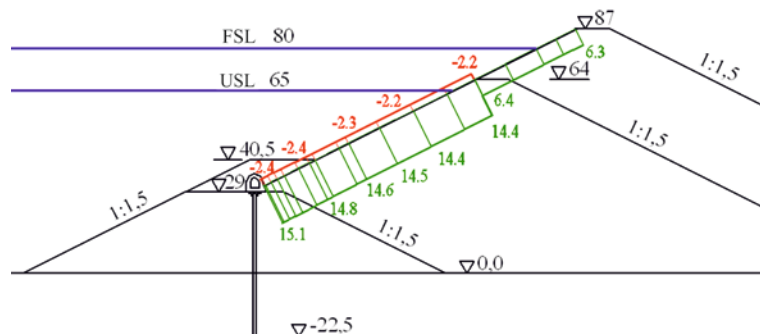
Reinforced concrete face displacements (cm) in the direction along the slope
